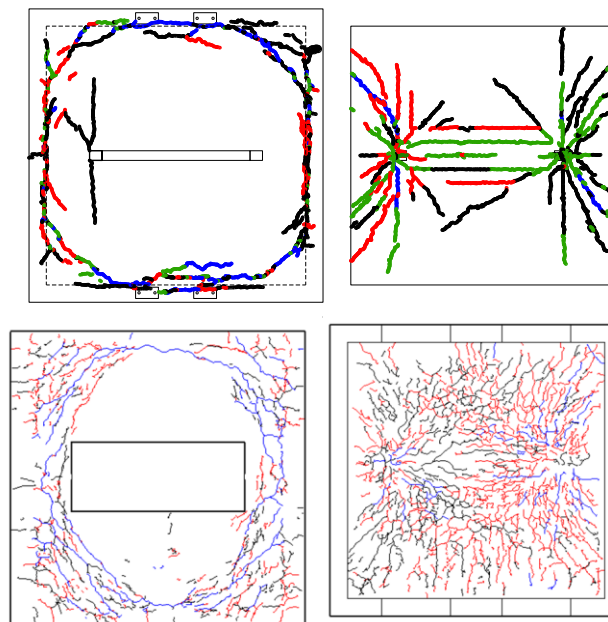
Cracking in the RC slab after applying the complete load cycles in the RC wall-slab prototype.
